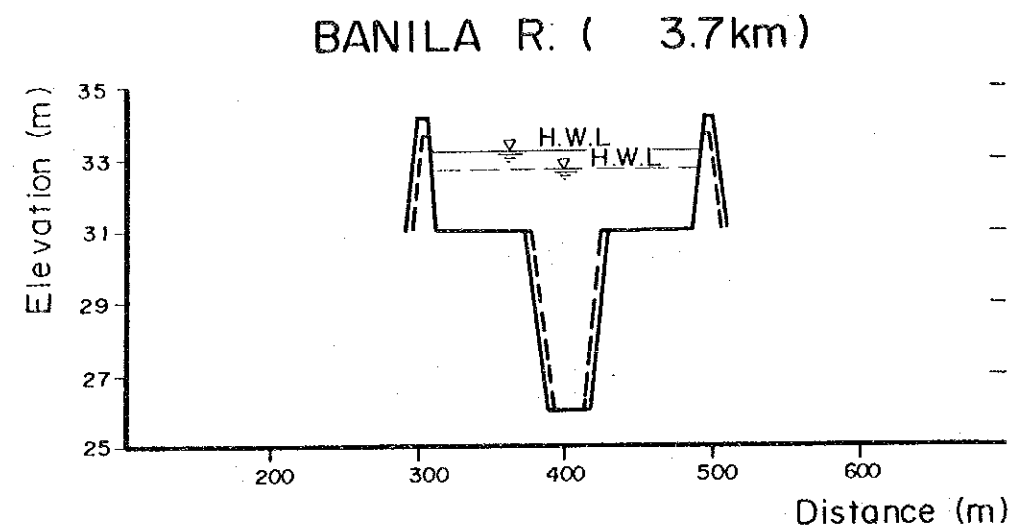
TYPICAL CROSS - SECTION OF BANILA RIVER
